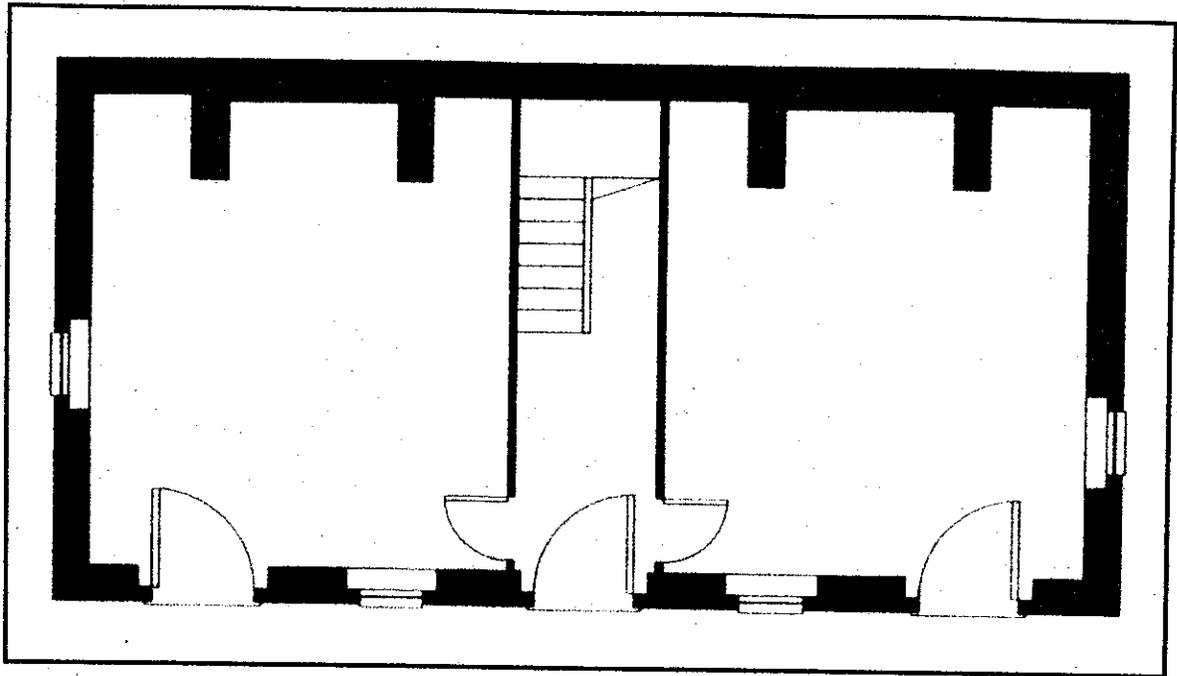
Kitchen building, Heyward Washington house, ca. 1740.
